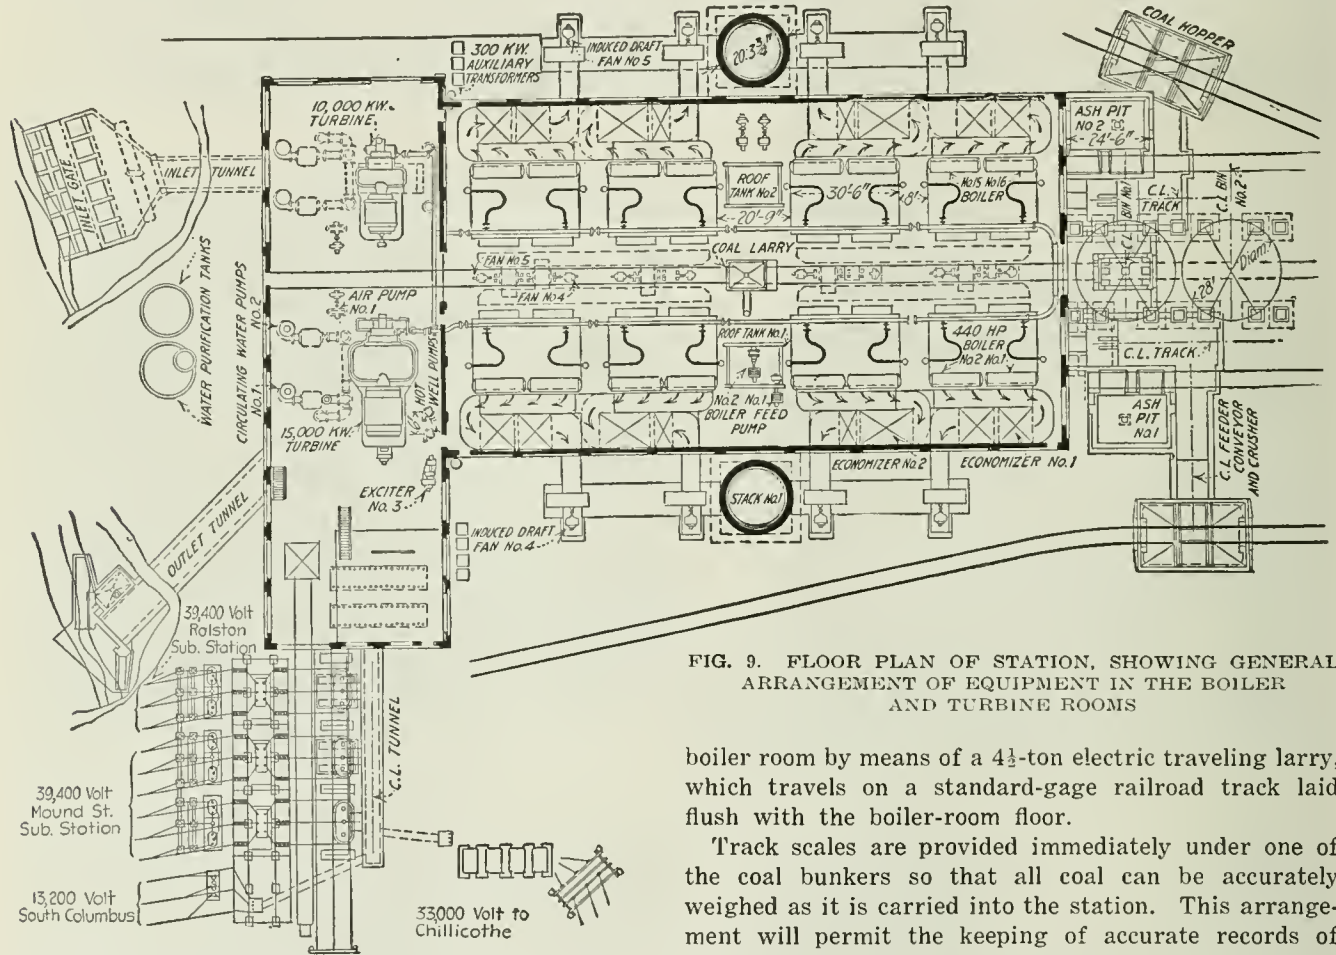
FLOOR PLAN OF STATION, SHOWING GENERAL ARRANGEMENT OF EQUIPMENT IN THE BOILER AND TURBINE ROOMS
